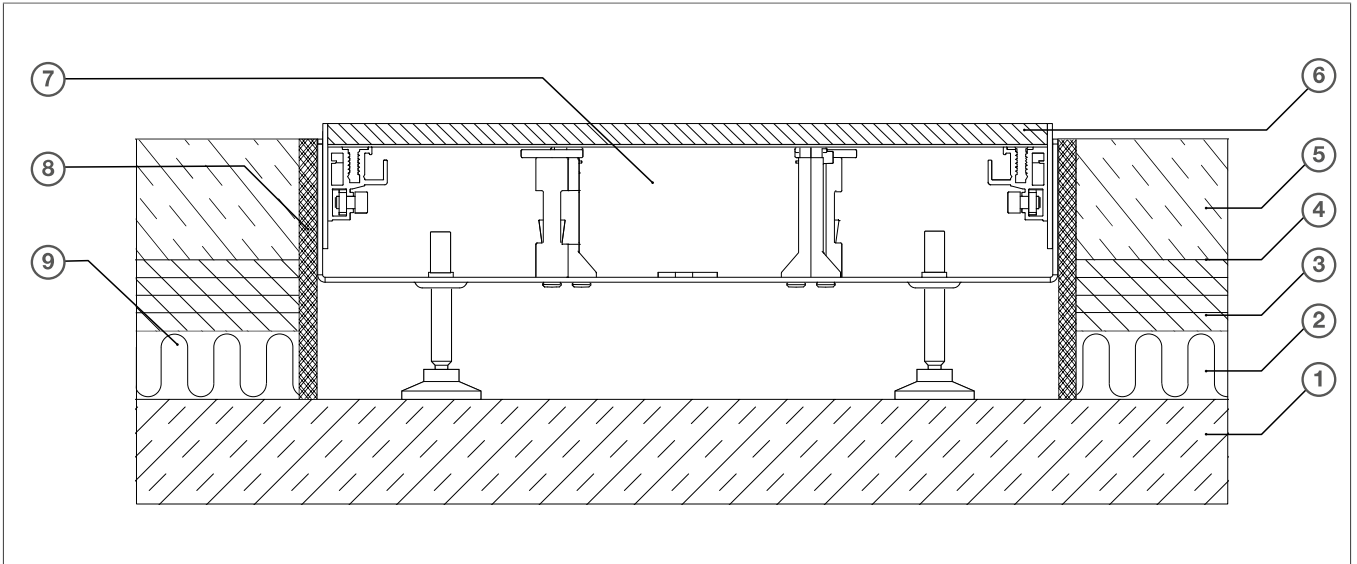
Concept drawing of the test setup for the BKGx floor trunking on the ceiling test station
